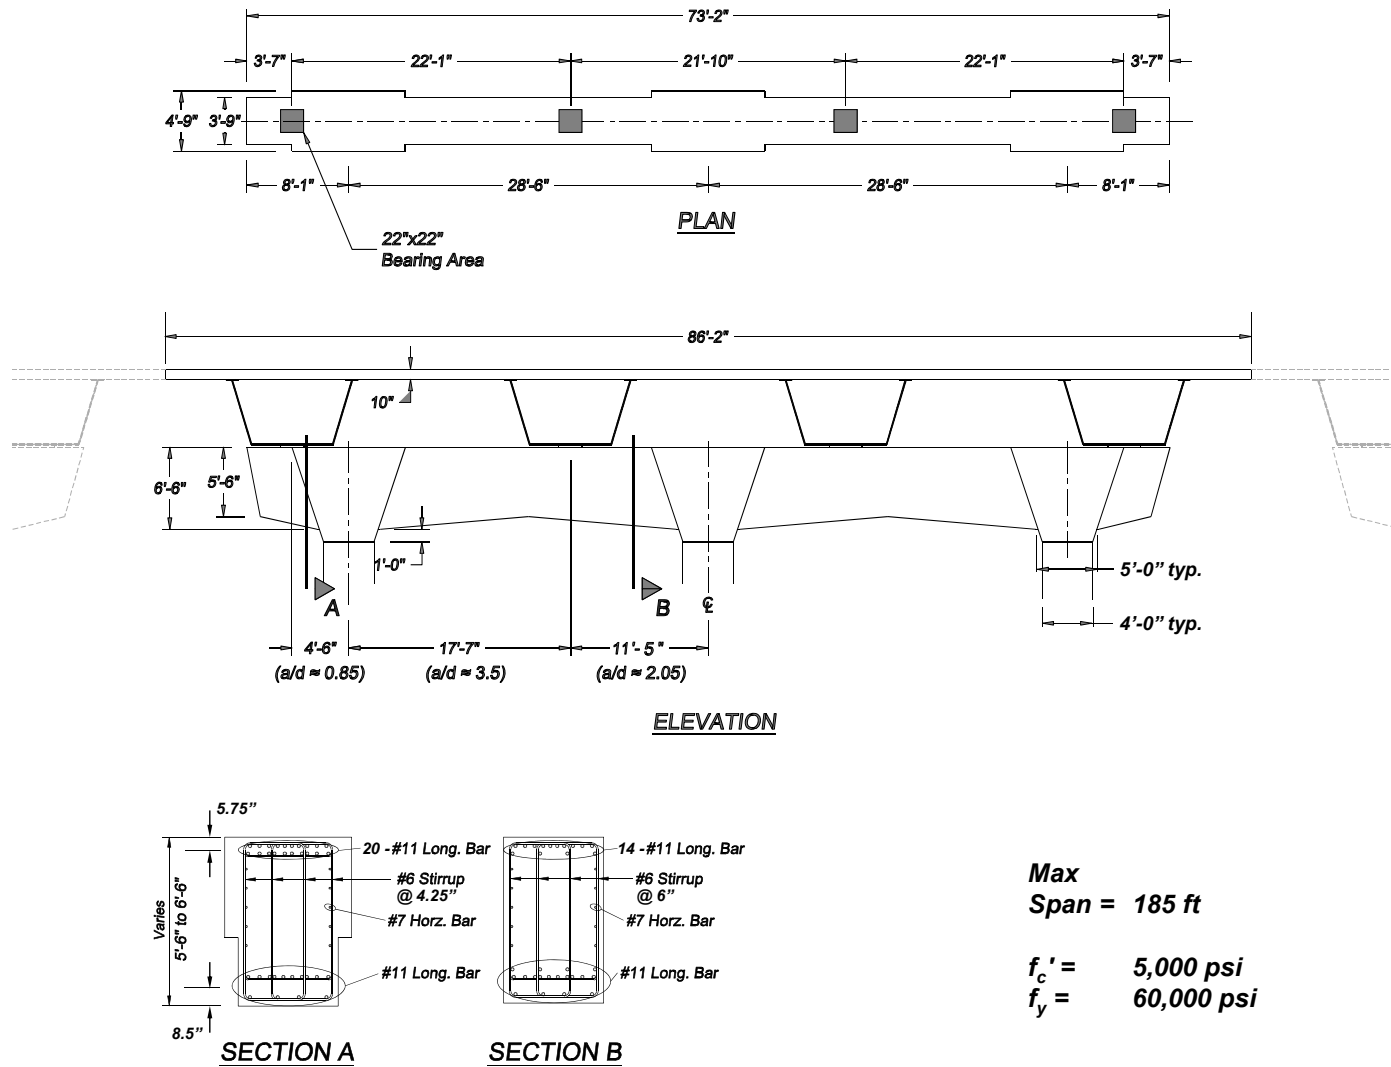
Preliminary plan; elevation; and cross-sectional details at critical shear regions.
